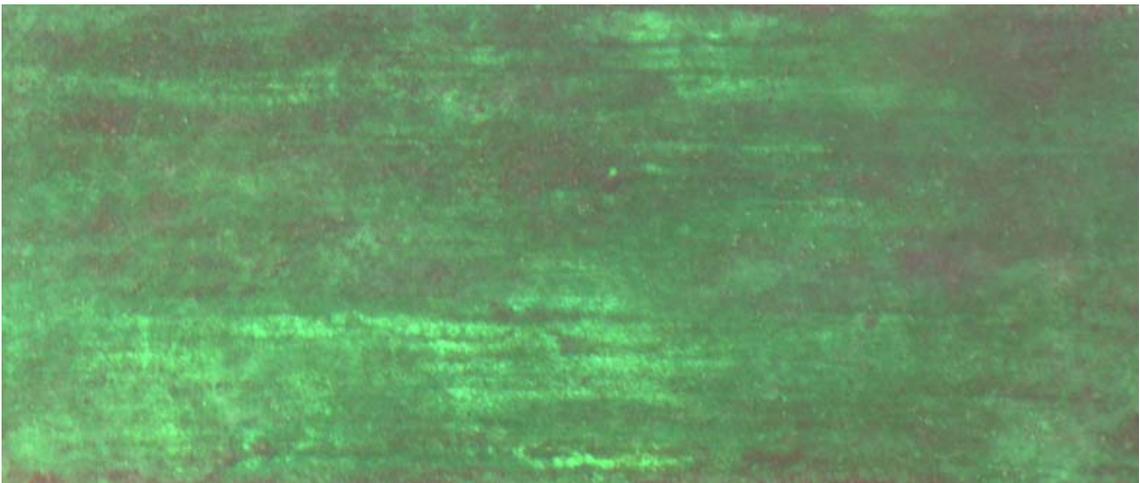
Bear Fall & Coon Creek Site 13 Spillway
